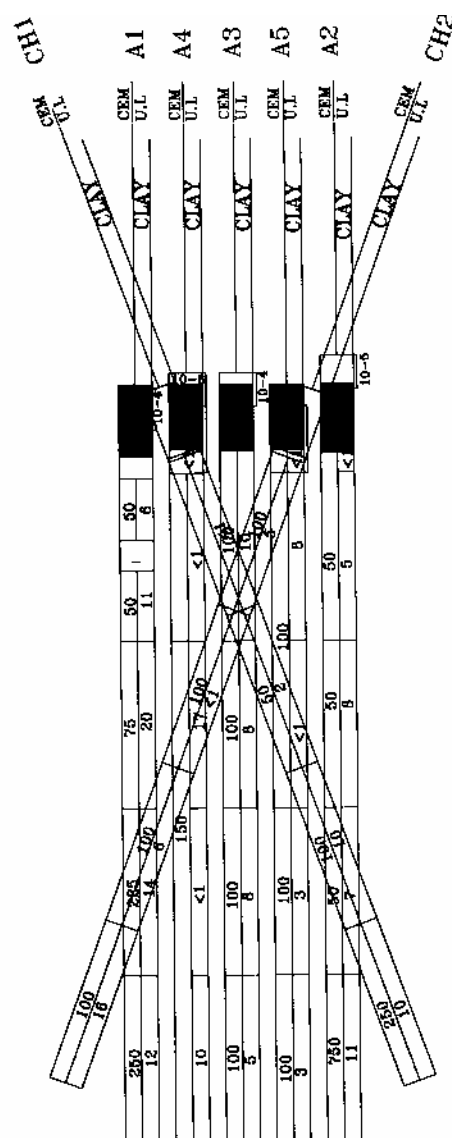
DETAILS OF TRIAL GROUTING IN 0+430 FROM LEFT OF THE DAM
